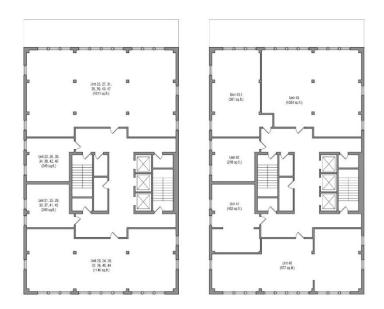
, 313 (left to right): Building 10, eleventh floor (1921); same floor (1979). 1'' = 32'. North is up.
